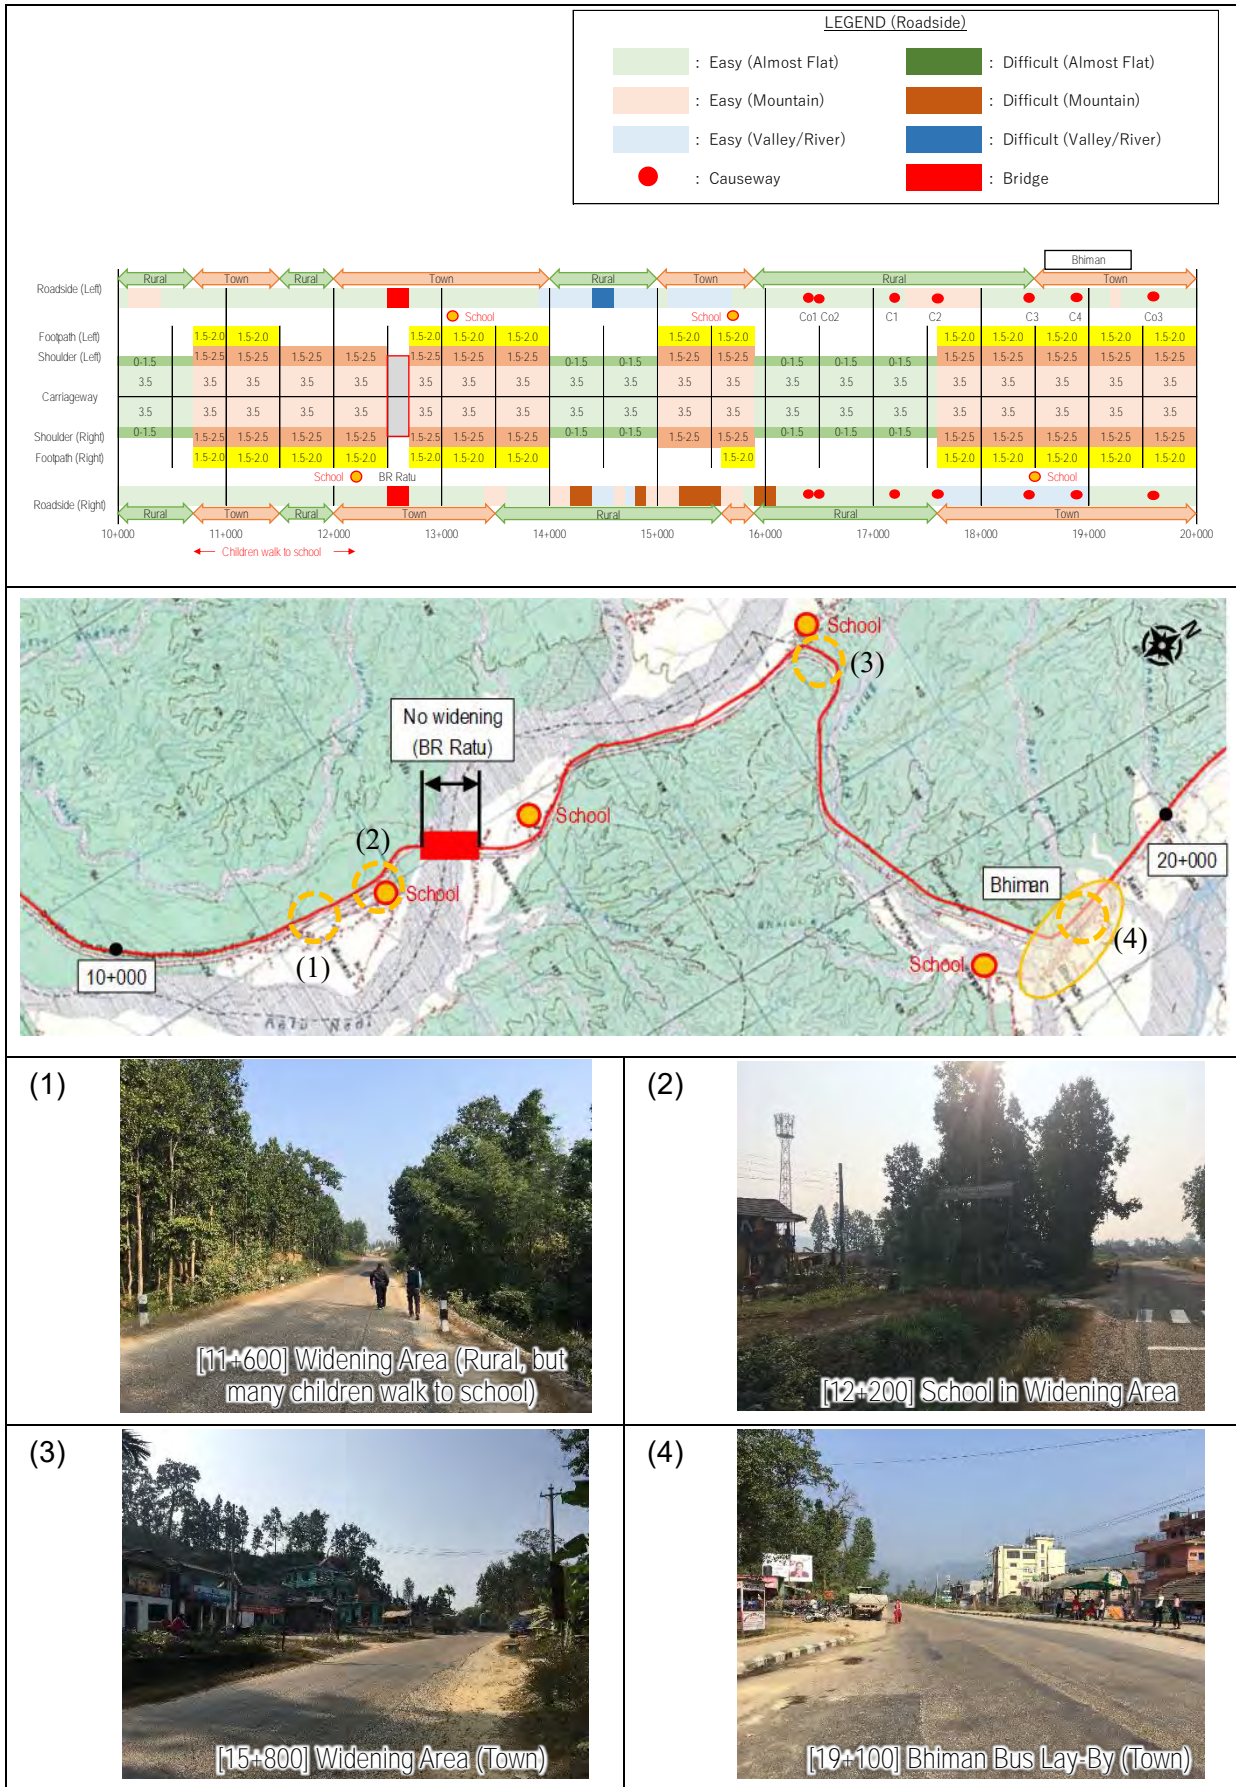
Example of Application of Cross Section Type (Ch.10-20km)
